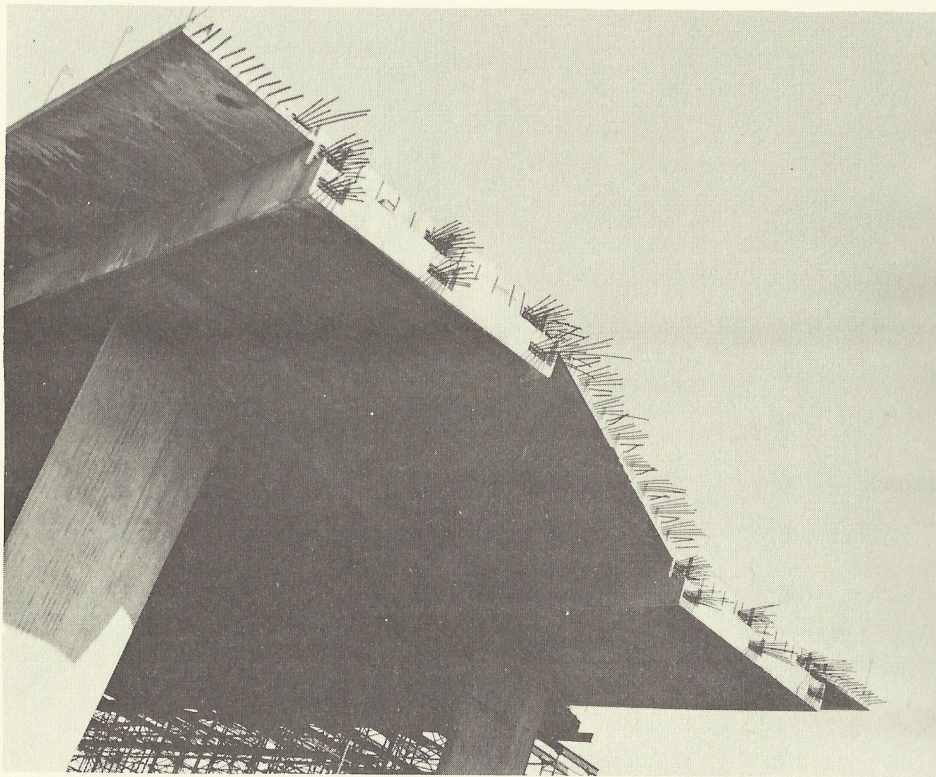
Approach structure cantilever spans. The cantilevers shown are staggered to accommodate a skew road crossing.
